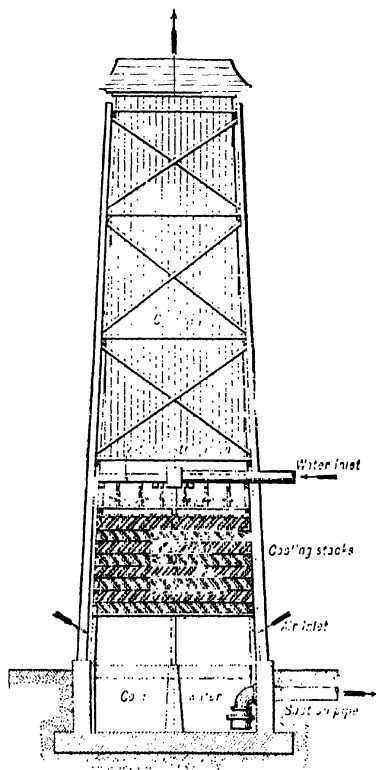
Natural Draft Cooling Tower, showing Zigzag Cooling Surface.
